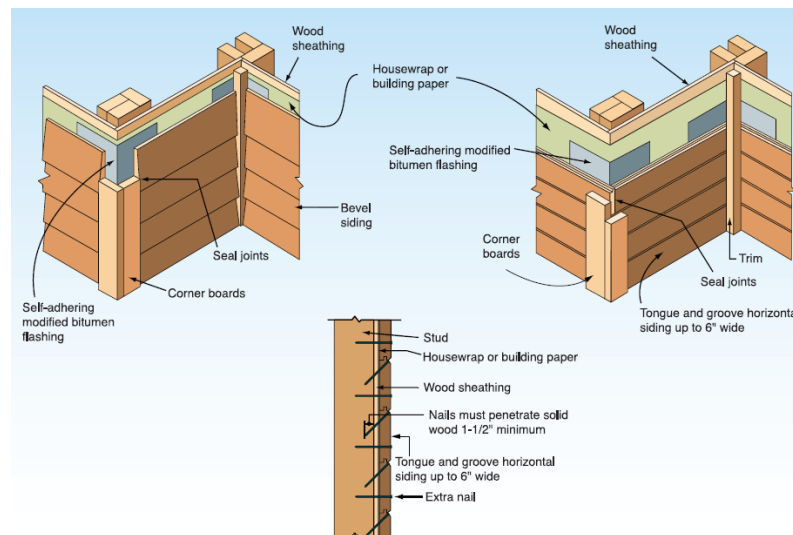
Wood siding installation details (FEMA 2010, Technical Sheet No. 5.3)
